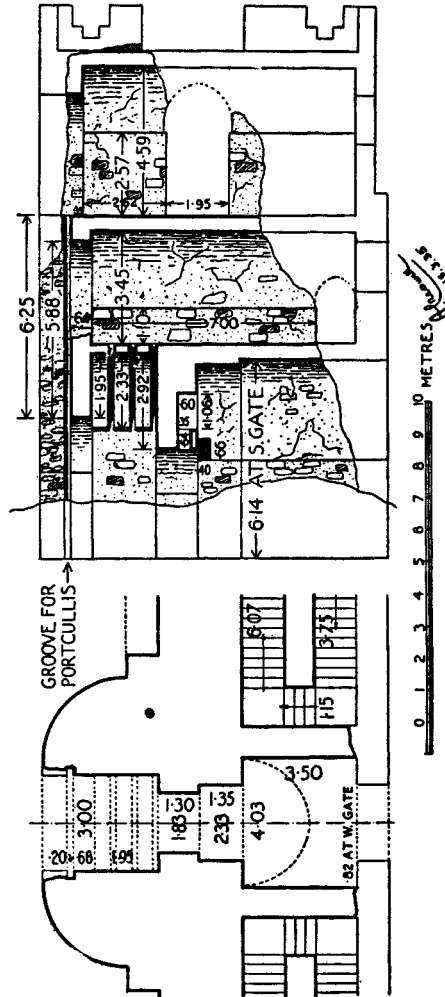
UKḤAYḌIR: plan and section of west entrance.
